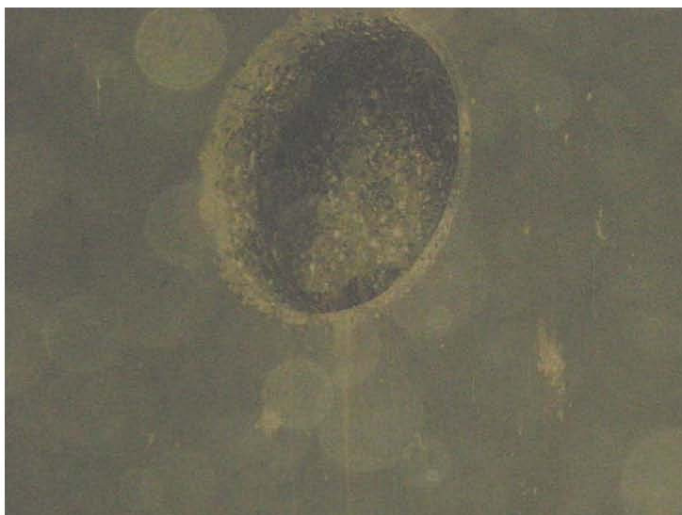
Tank Shell Interior at Bottom Showing Manhole
